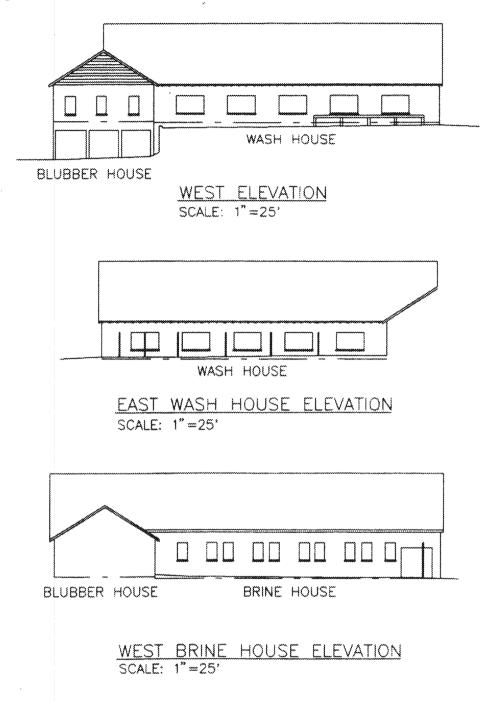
These three elevations show the building as it was originally built, except for the alignments of the seal pens, shown on the west elevation as five vertical bars.
